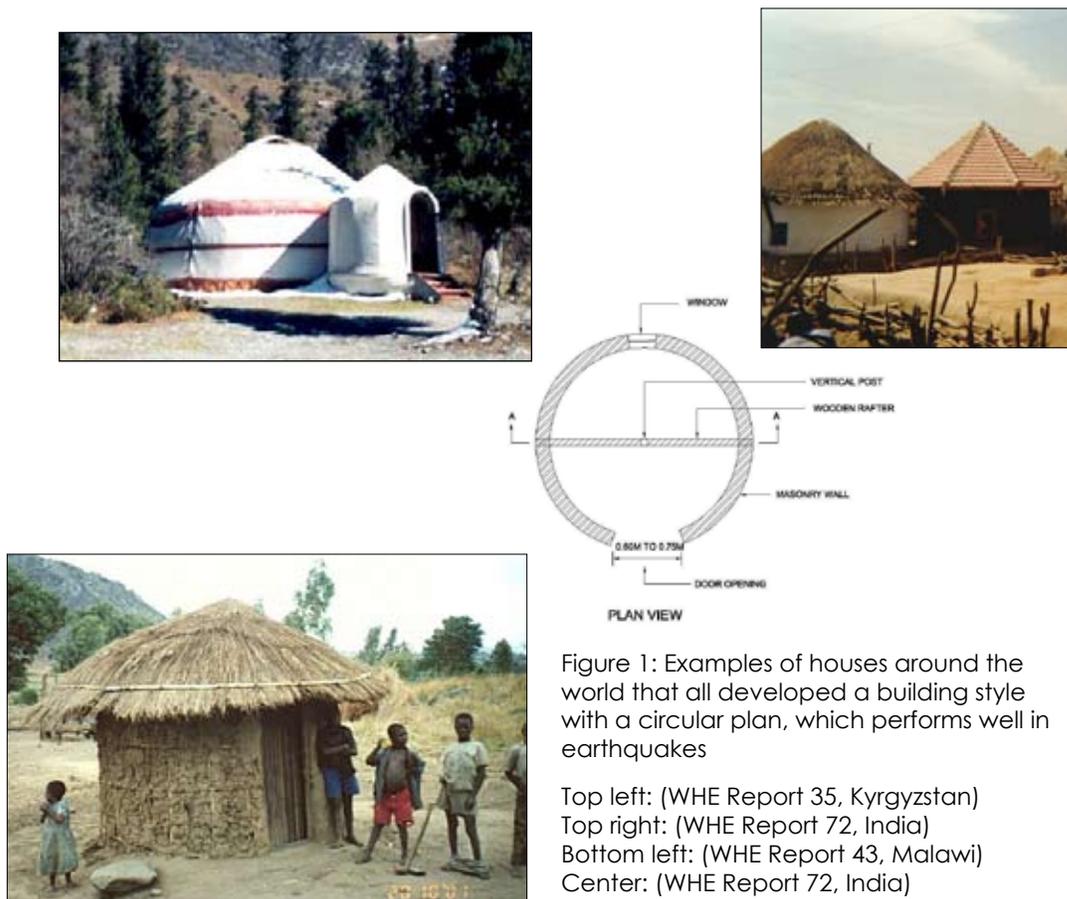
Examples of houses around the world that all developed a building style with a circular plan, which performs well in earthquakes
